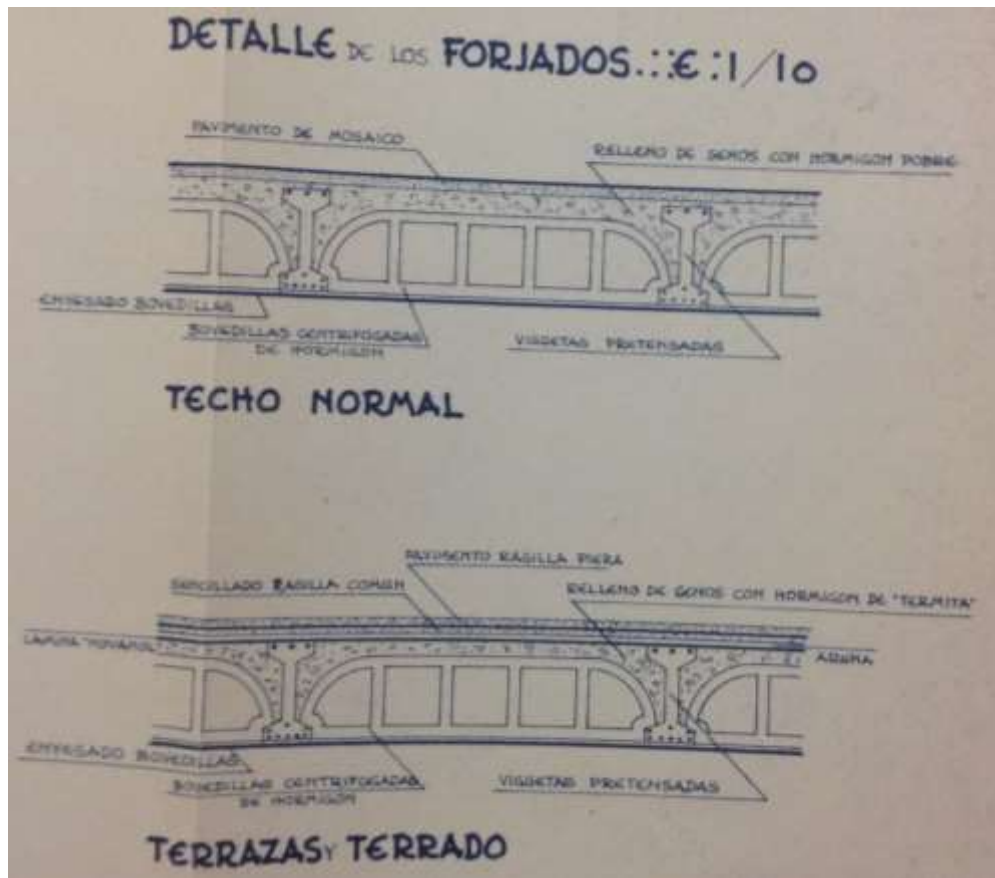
Slab-floor typology of reinforced concrete building of Villarroel Street 187.
